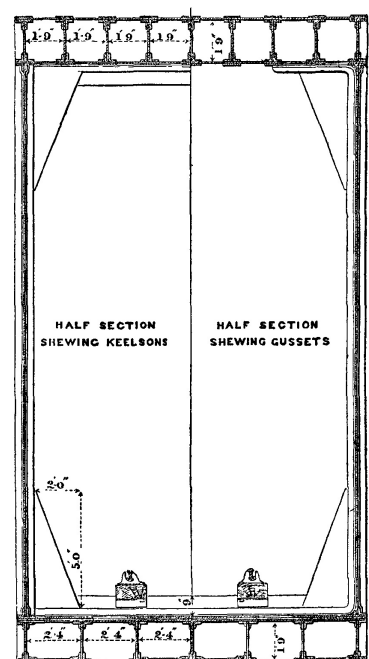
Britannia Bridge (Cross Section of Tubular Girder).
